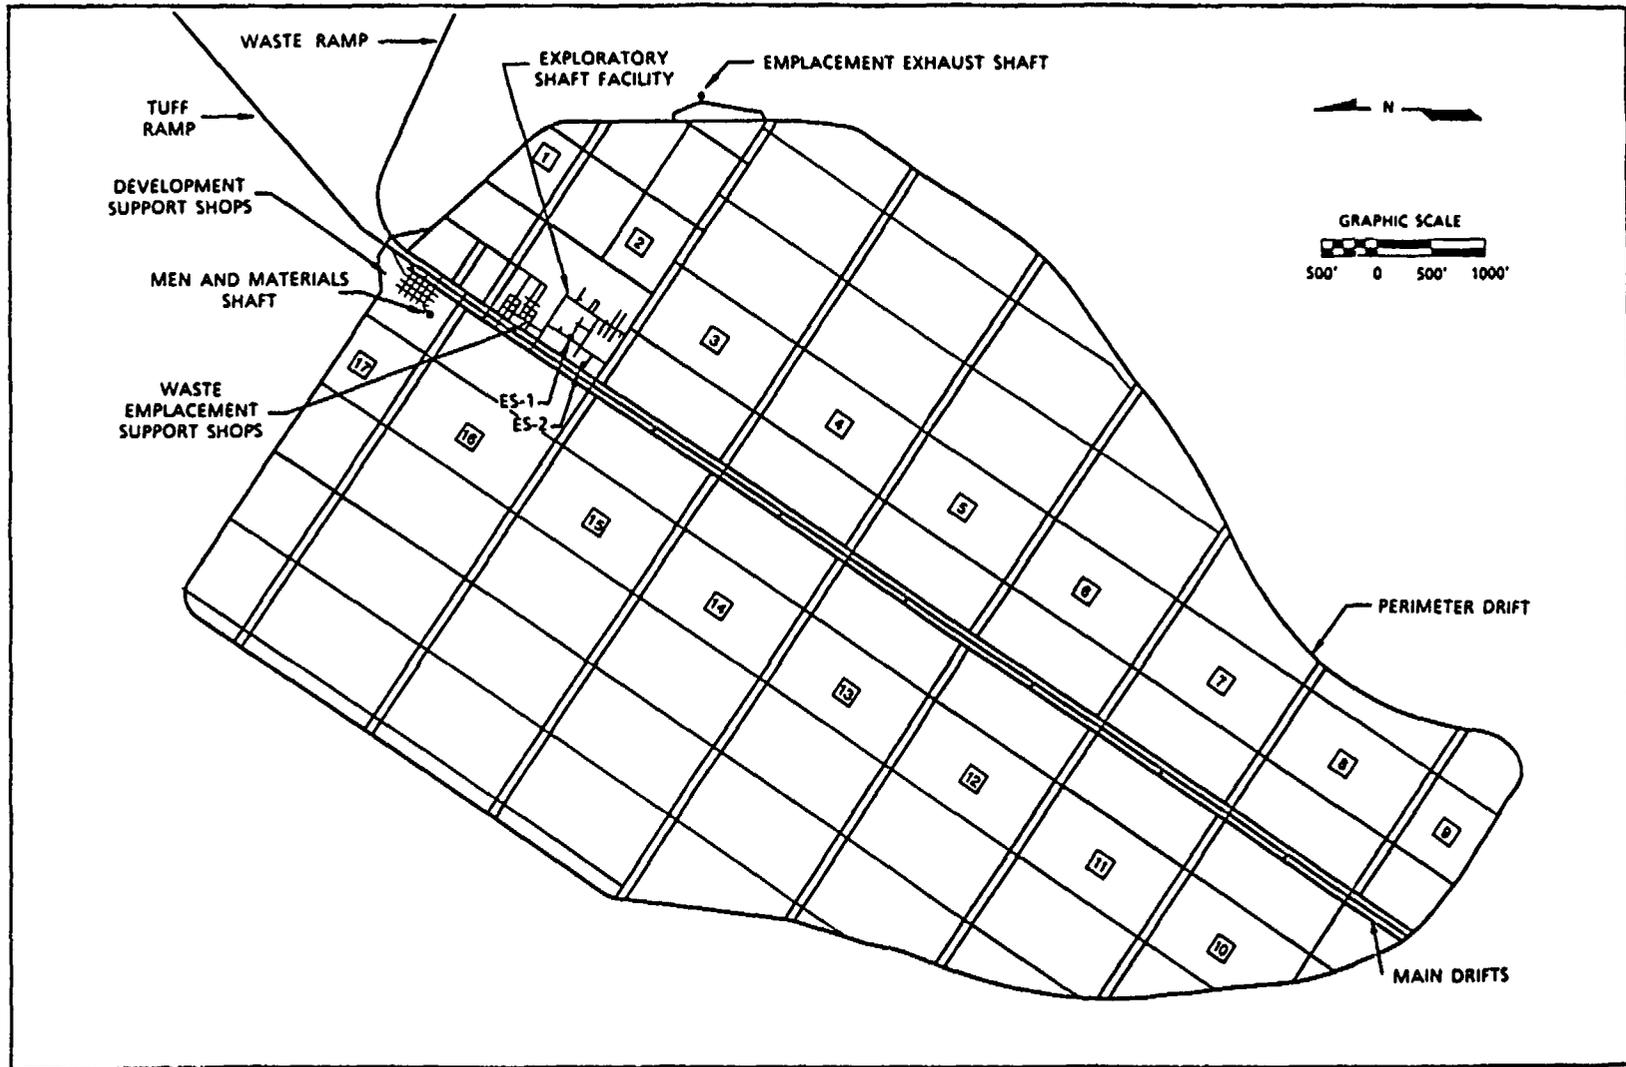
General Underground Facility Layout, Commingled Waste, Horizontal Emplacement (from Figure 4-30, SCP-CDR)
